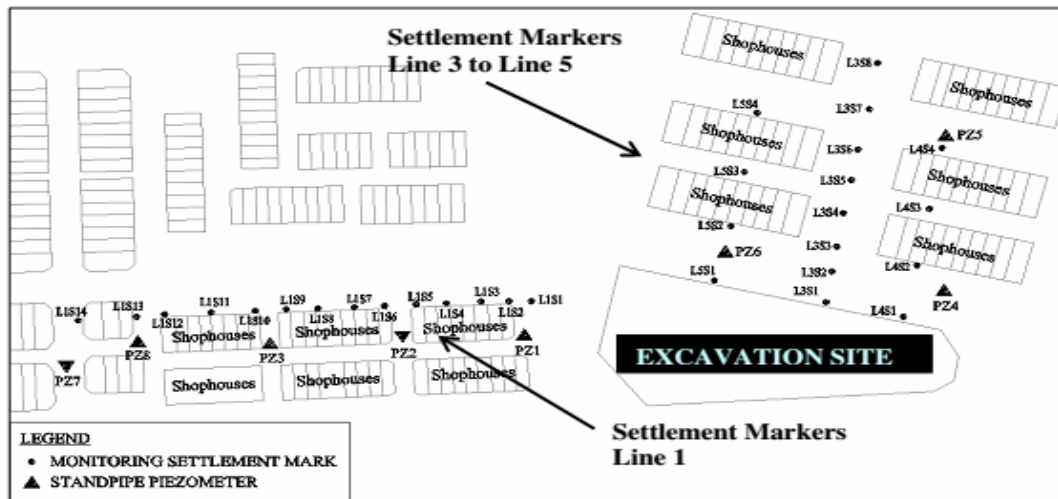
The project excavation site surrounded by many shop houses, [14]
